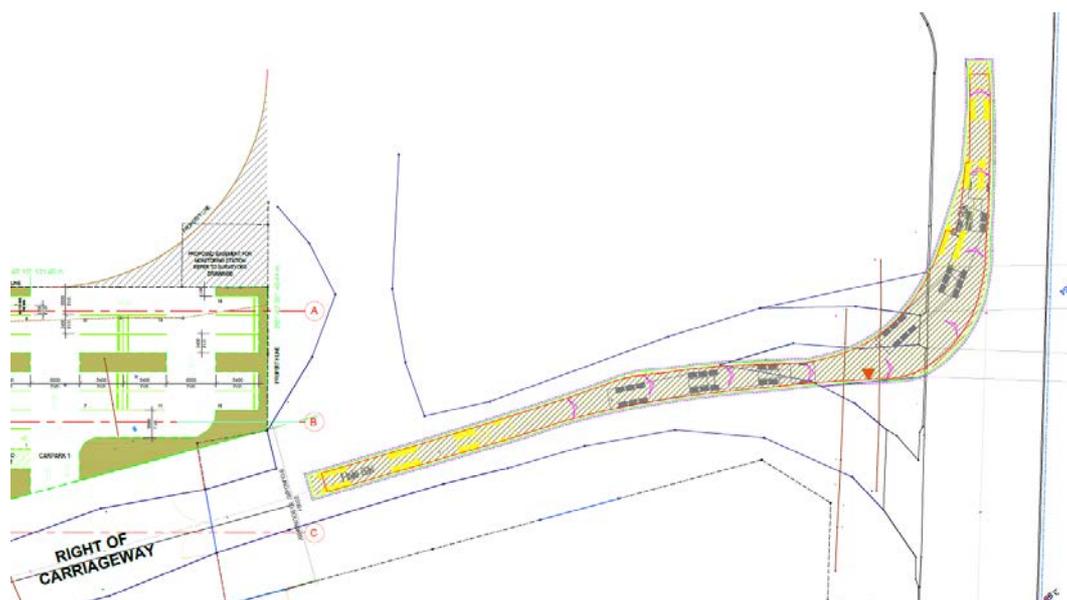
| Heavy Vehicle Swept Path – Exit onto Raven Street
